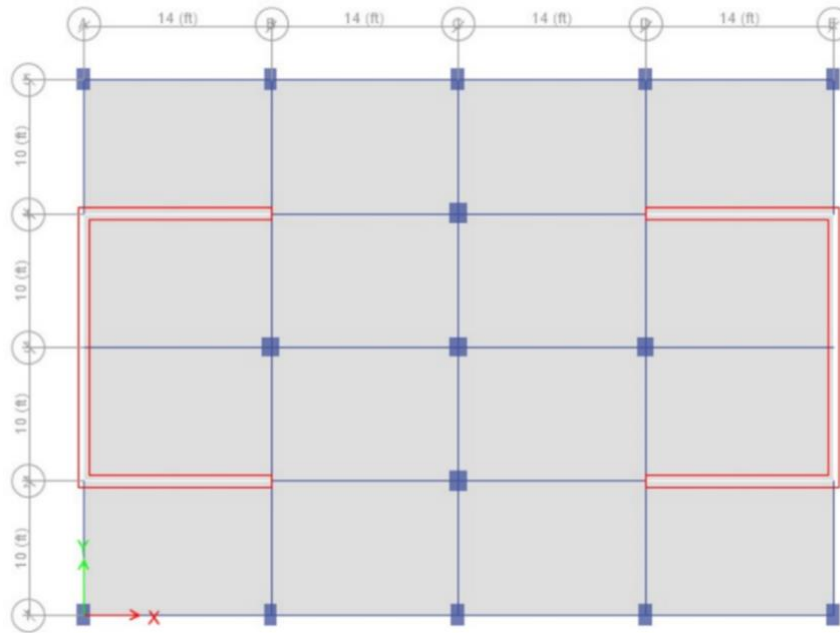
Model 3 (Shear wall at sides & inner wall)
